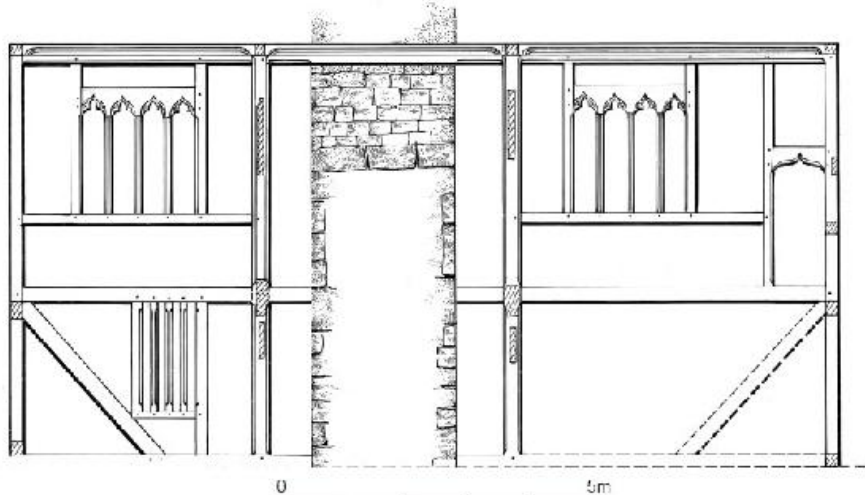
Reconstruction of the interior face of the south frame of 20 Church Street; the only section in doubt is the ground floor to the west (or right) where little primary framing survived
